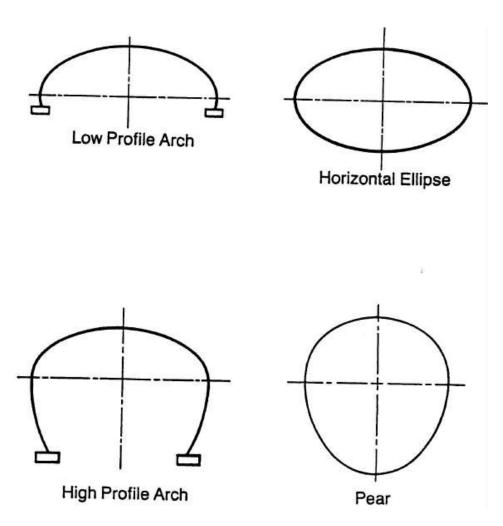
(Exhibit 93) Typical Long-Span Shapes
